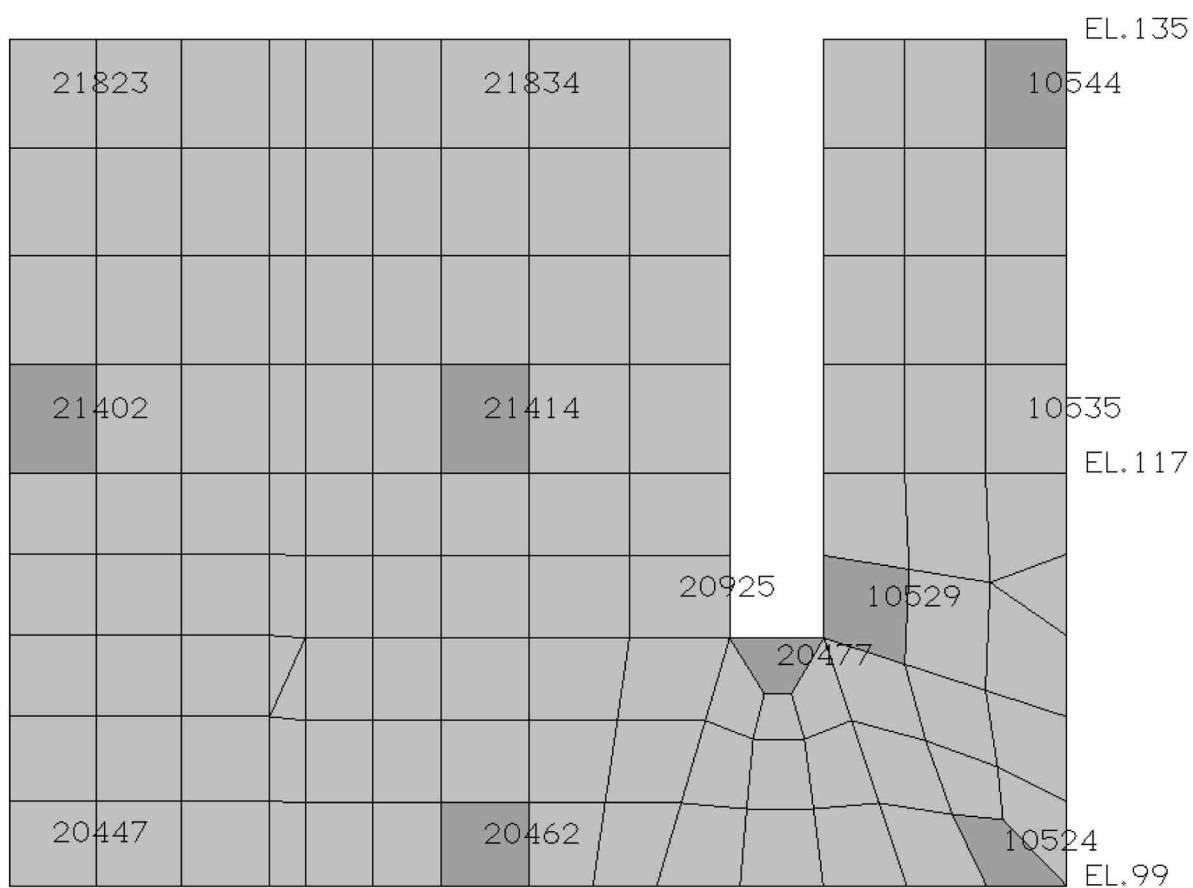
H.5-10 [Spent Fuel Pool Wall Divider Wall Element Locations]
